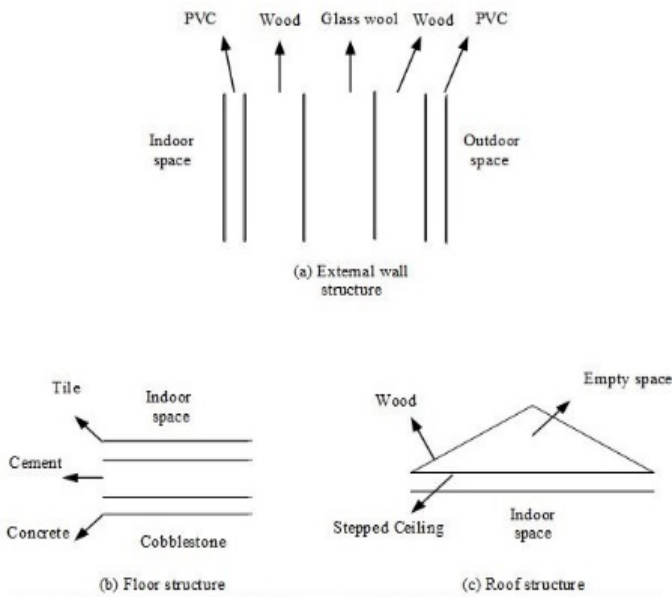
LWB external walls, floor, and roof structures layout: (a) External wall structure, (b) Floor structure, (c) Roof structure.
